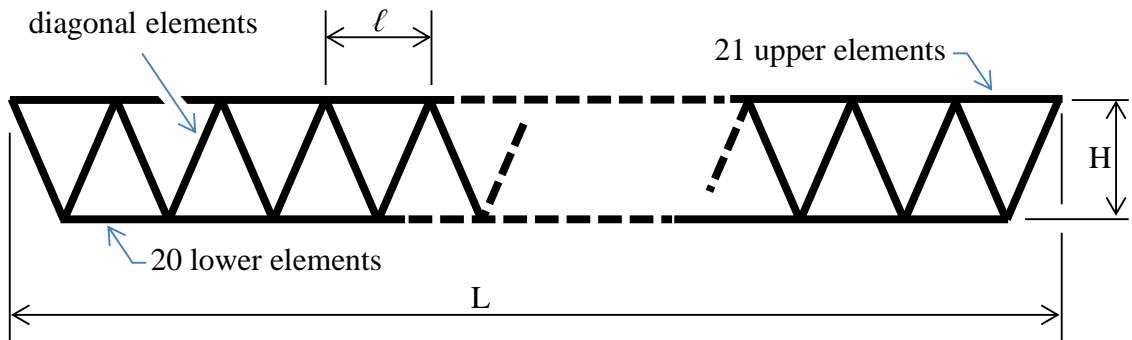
Truss-beam geometry. Source: Burdisso and Haftka (1989).
